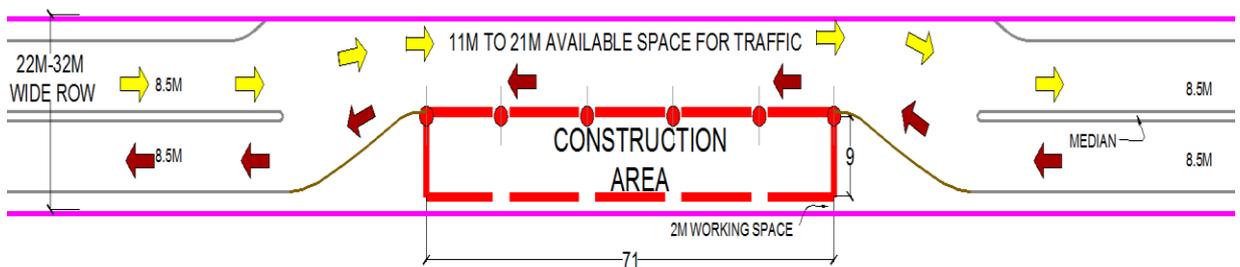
TYPICAL TRAFFIC DIVERSION PLAN
